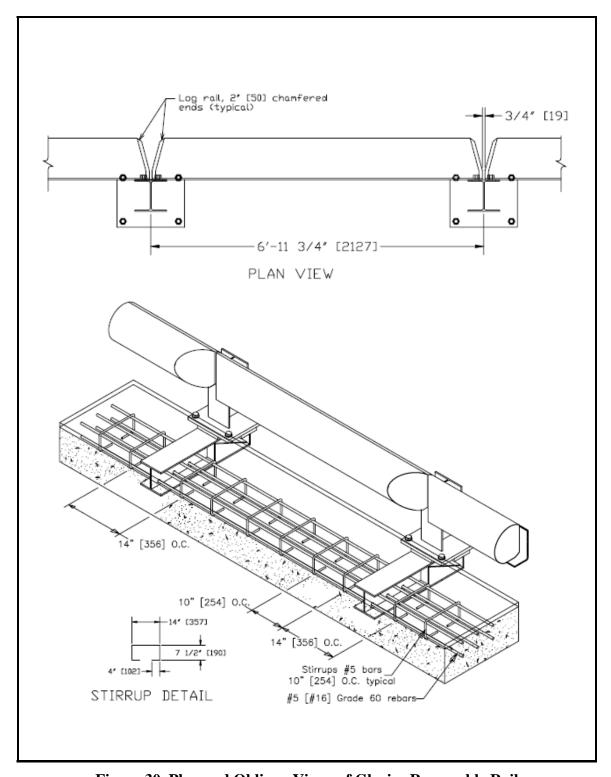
Plan and Oblique Views of Glacier Removable Rail
